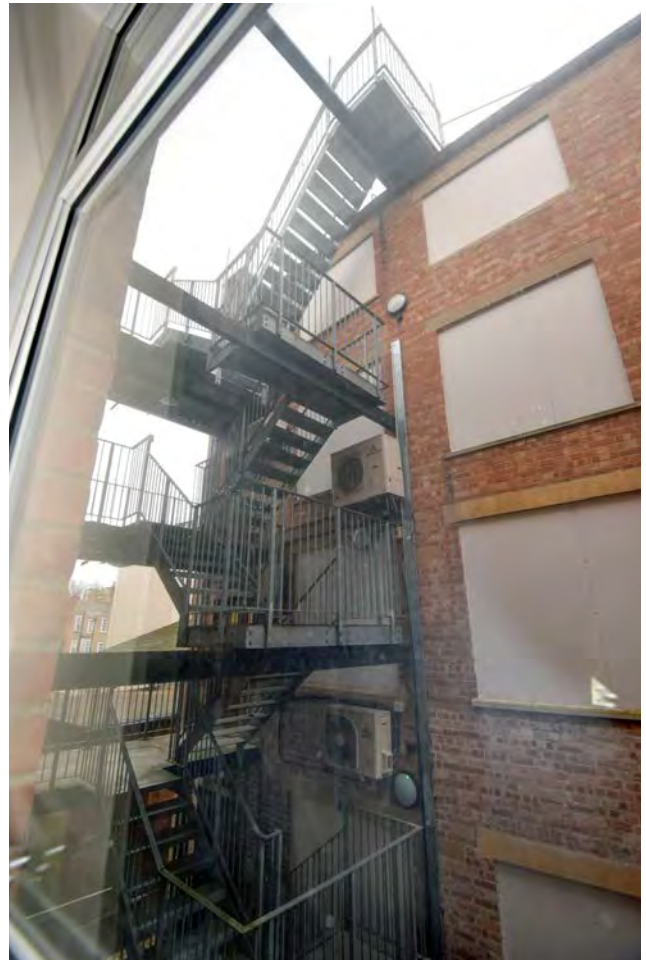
The central lightwell in 1 to 5 Broad Street, looking south-east
